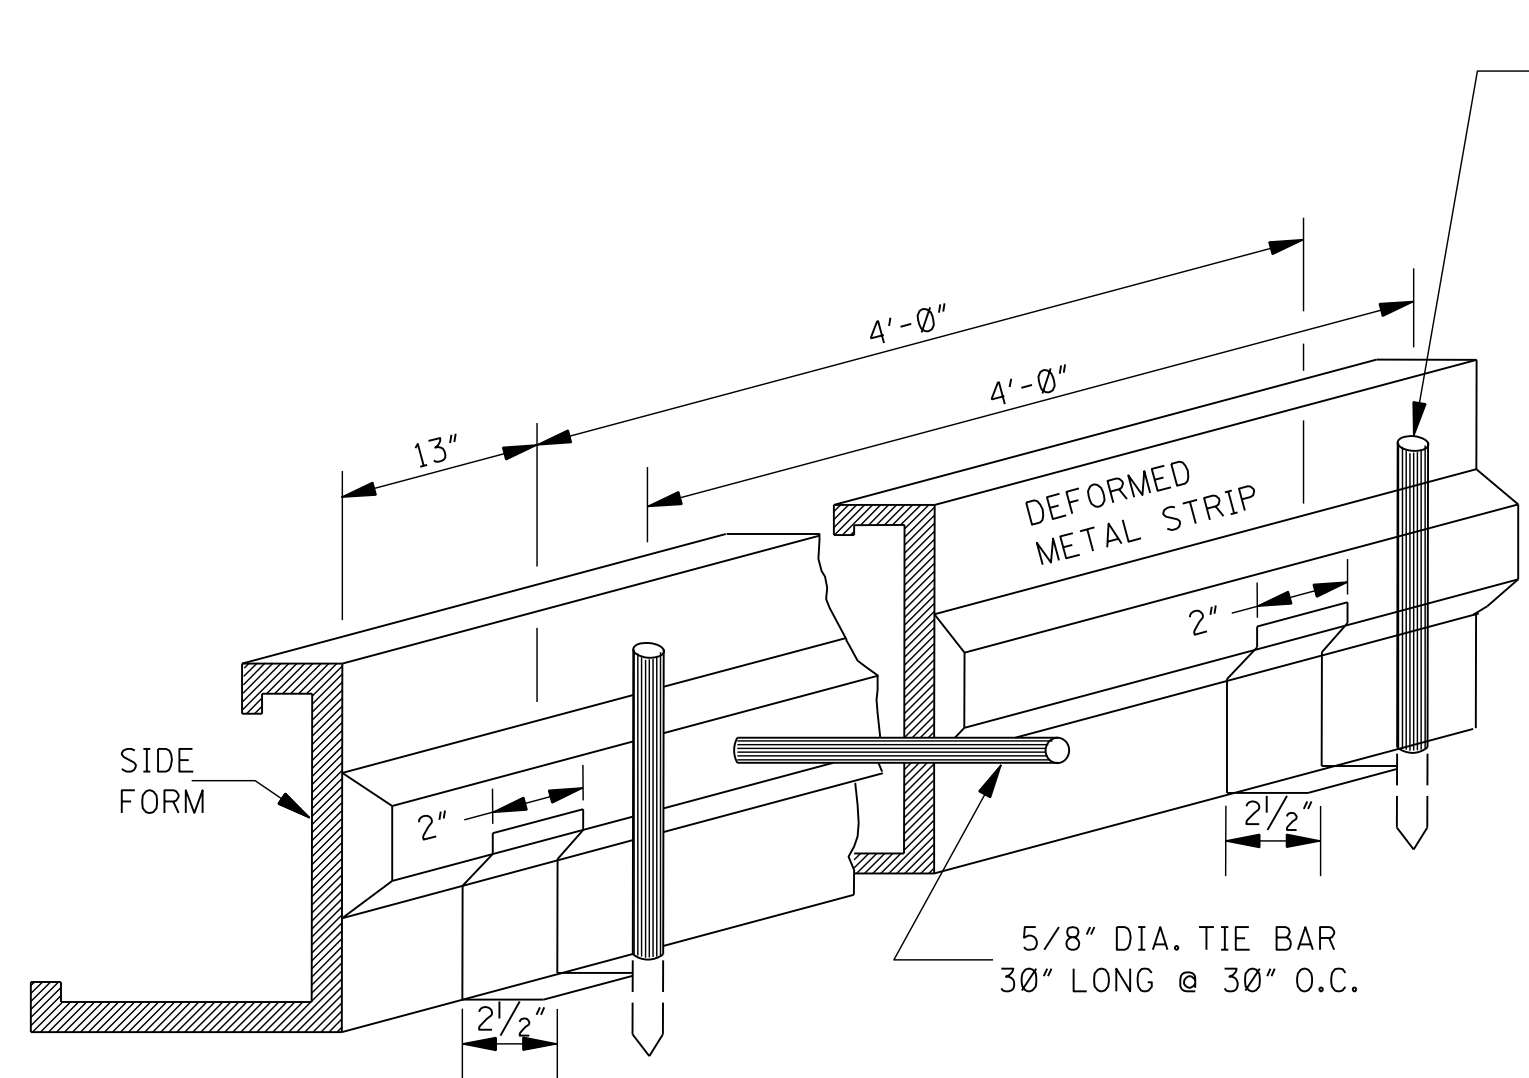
DETAILS OF LONGITUDINAL JOINTS FOR CONVENTIONALLY REINFORCED CONCRETE PAVEMENT
